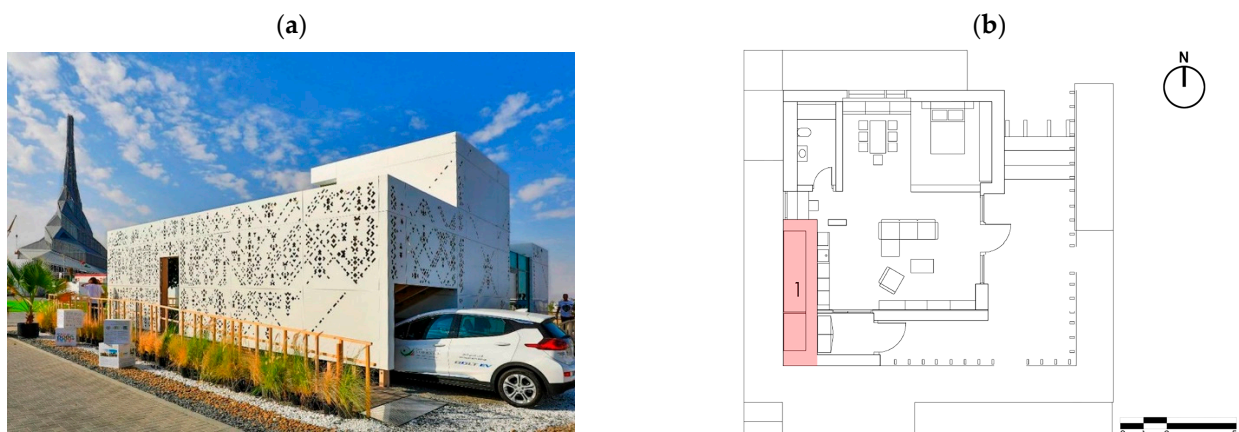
Team Efden house. (a) Exterior photo. (b) Floor plan—1: technical room. (Photo: SDME 2018 Organization. Floor plan: by authors based on team Efden’s drawings).
